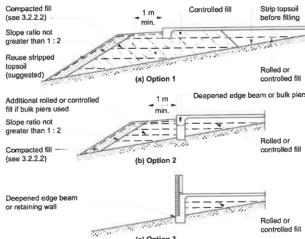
FOUNDATIONS FOR FOOTINGS AND SLABS
